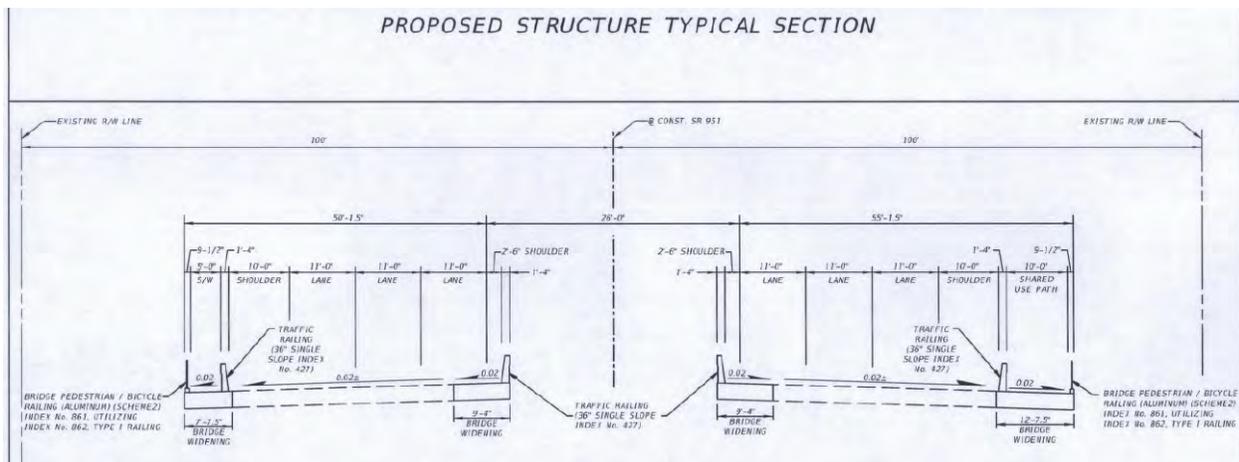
Proposed Typical Section for the Henderson Creek Bridge (FPID 435111-2)
